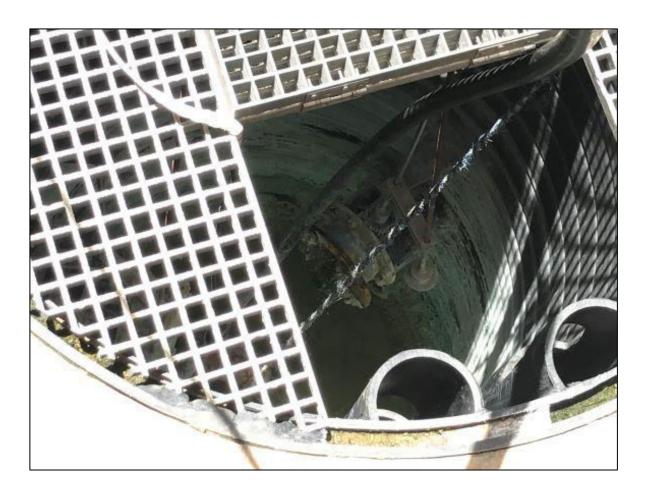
Cell 1 outlet pipes into HDPE sump
